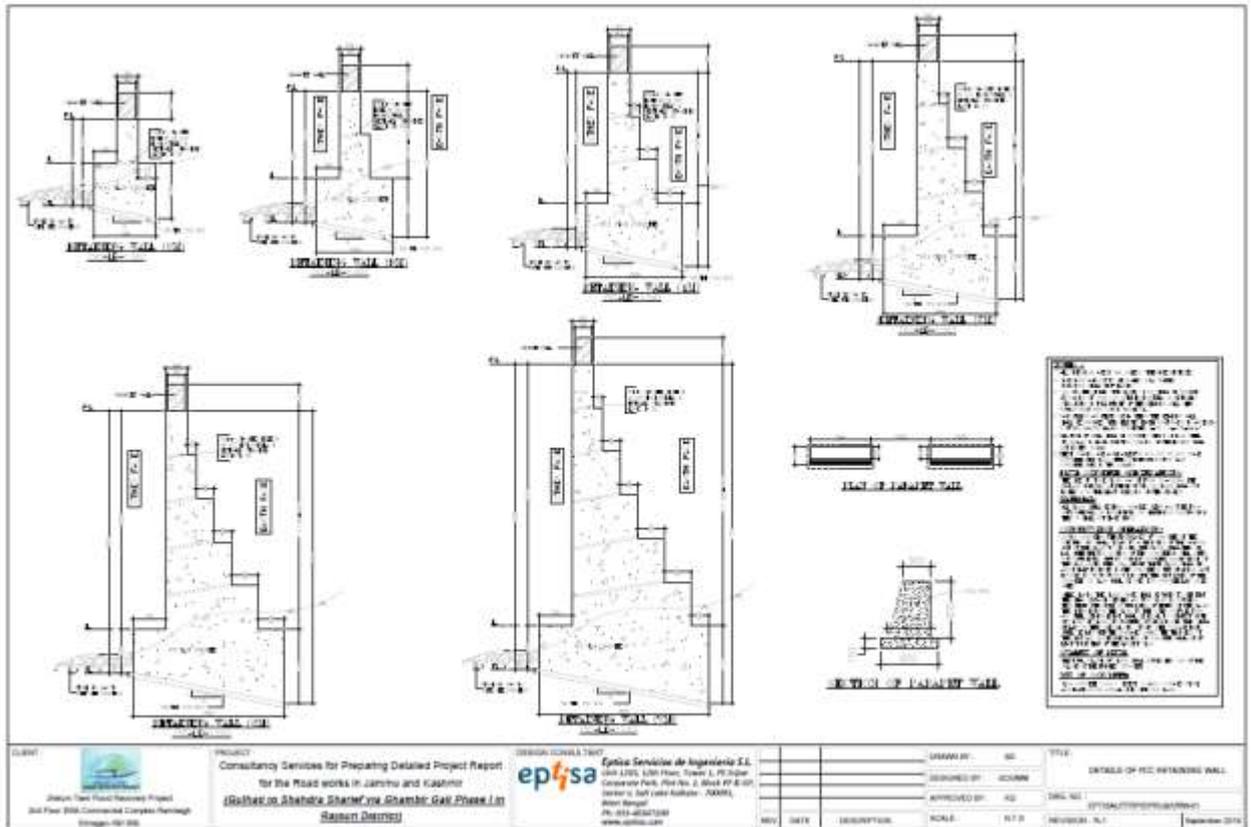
Section and Plan of Parapet Wall and Retaining Walls
